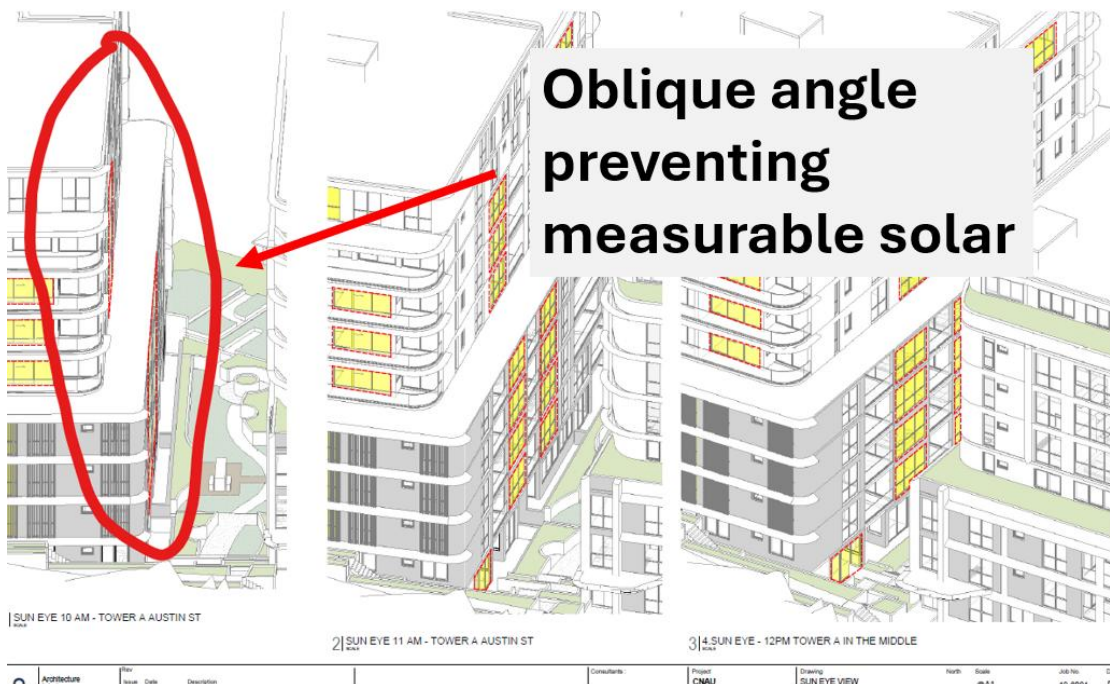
Tower A Western façade facing COS (Source: Updated Architectural Diagrams – DA9037)
